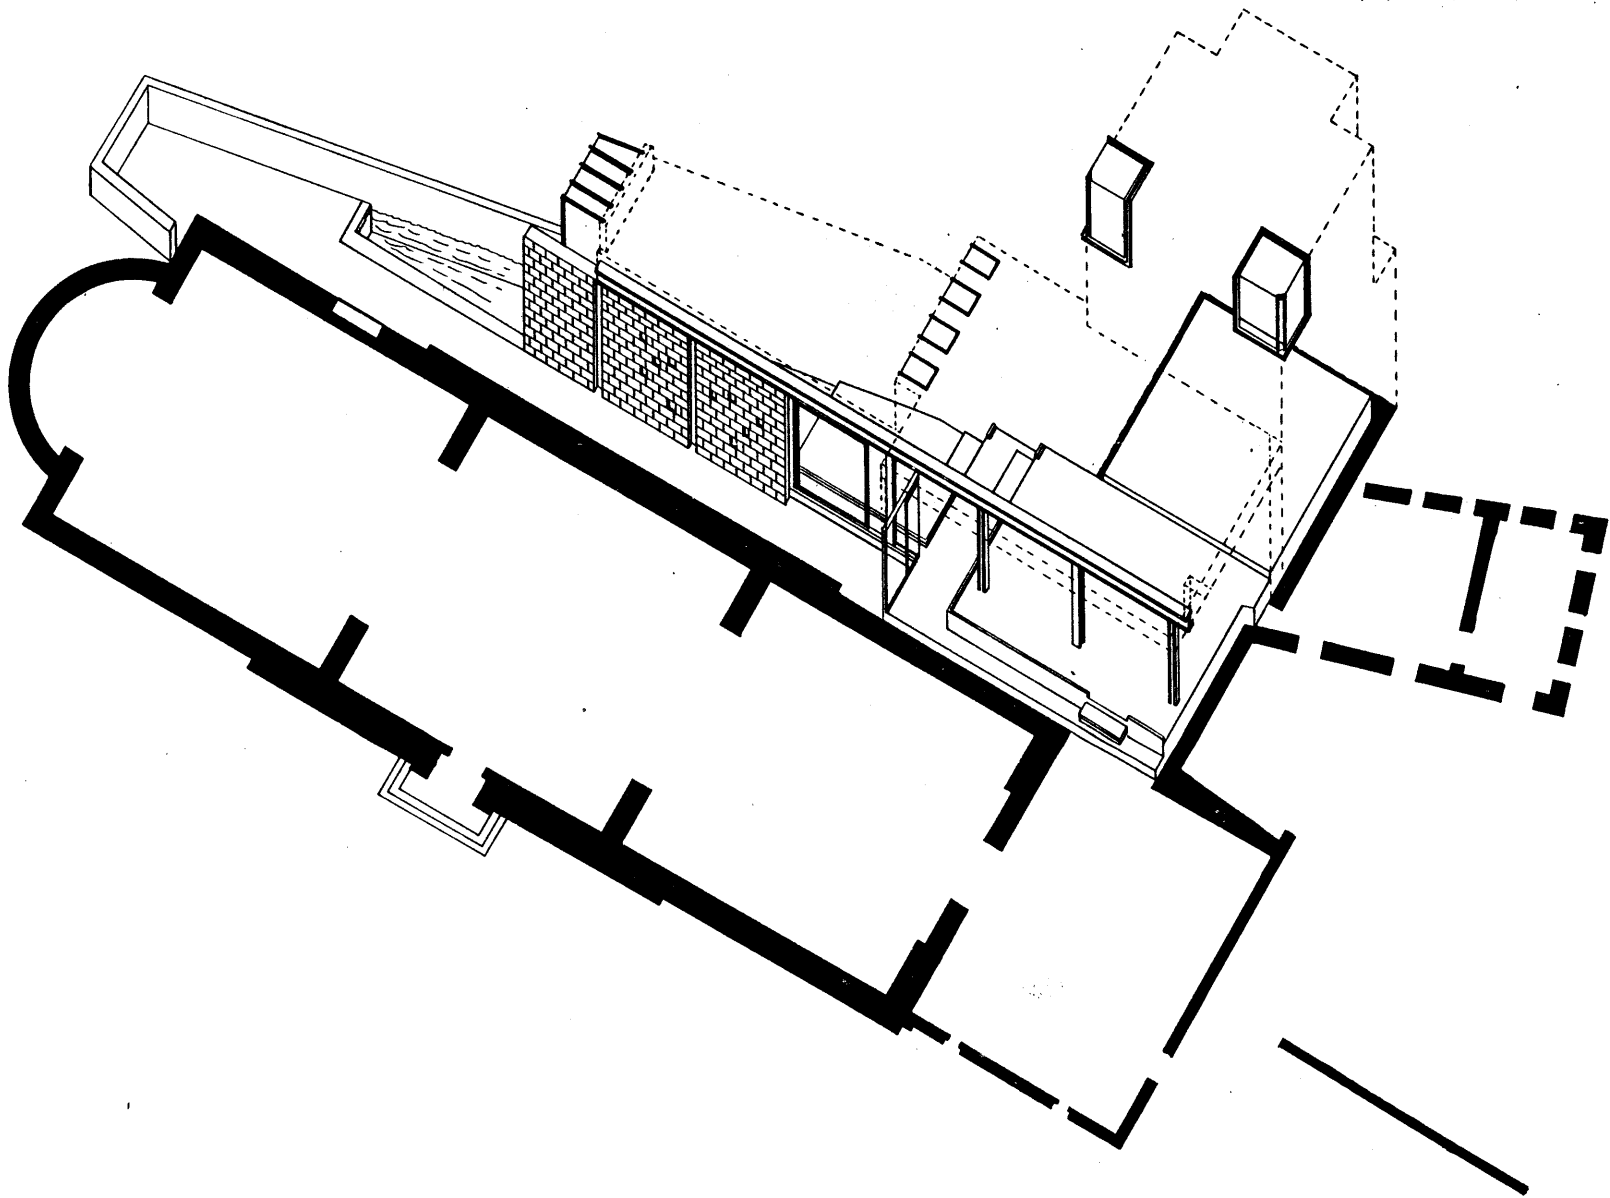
Buffer space (between basilica wall and column wall) is cut in half by a glass wall.
